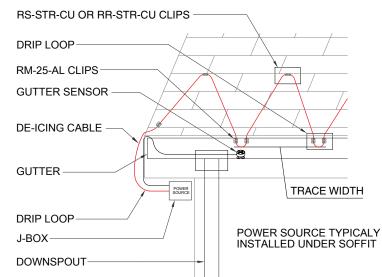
De-icing cable on sloped standing seam metal eave, inside of gutter, and in downspout. This layout typically uses RM-AL-25 clips with VHB adhesive pads. Clip de-icing cable laying in gutter to bottom of gutter every 3-5'. For copper gutters use RM-25-CU clips. Use DSH to hold de-icing cable at top of downspout.
